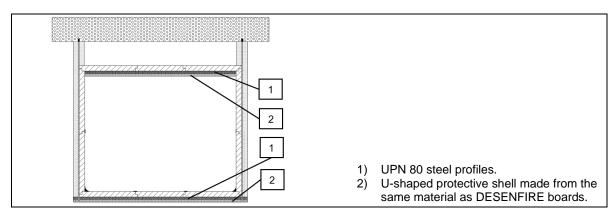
Reinforcement of big section ducts with UPN profiles (duct cross-section).
